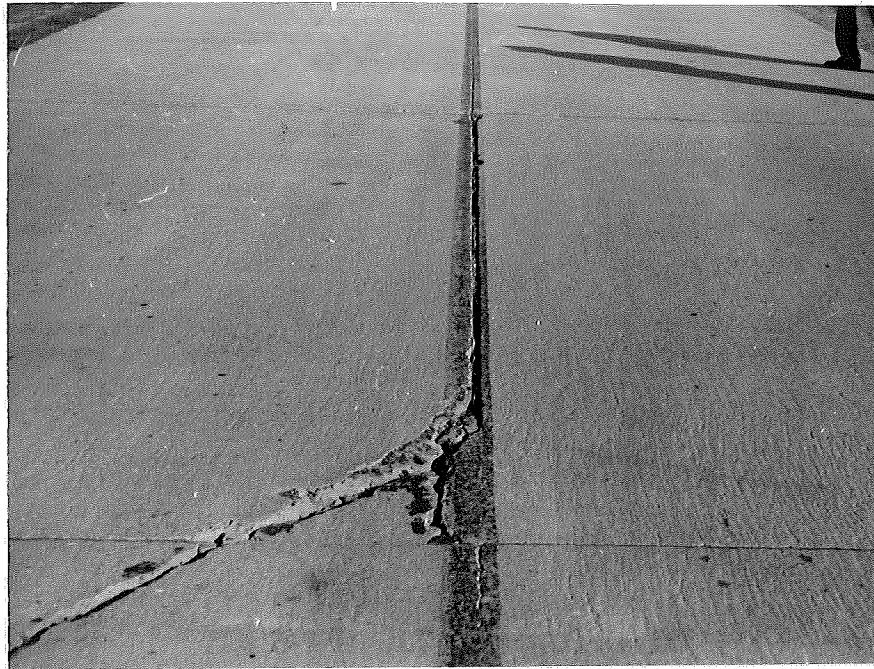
Center joint open 1 inch; evidently tie bars were left out of this slab during construction. Slab displaced sideways. See Figure 7. Station 325+50.
